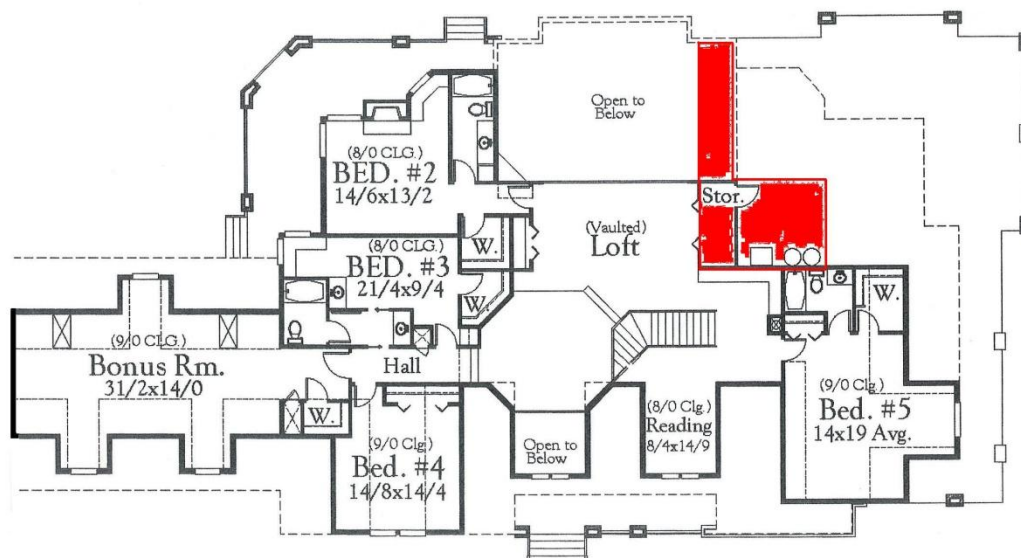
Second floor plan. Pathway leading to laundry room and void space highlighted in red.
